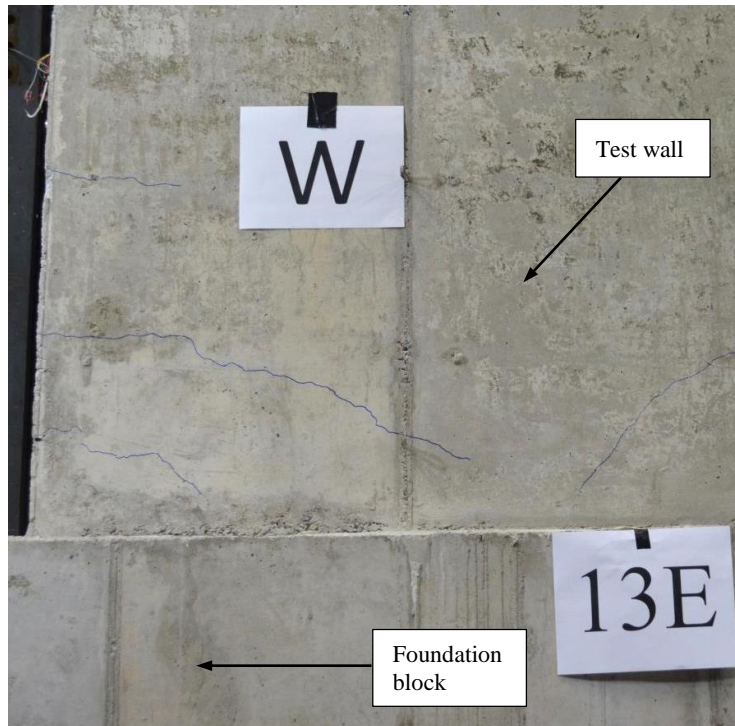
Photograph of observed initiation of concrete cracking on the West side Wall 1
